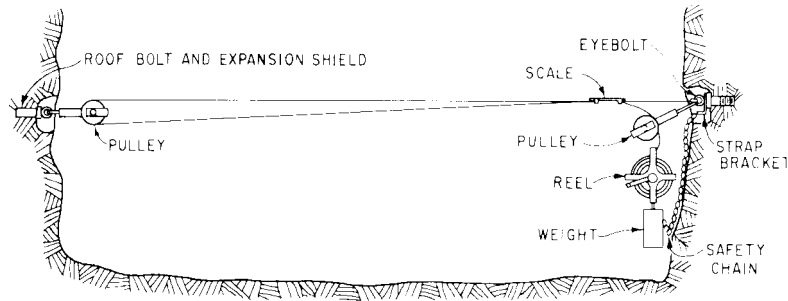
Tape Extensometer with Vernier Readout and Deadweight
